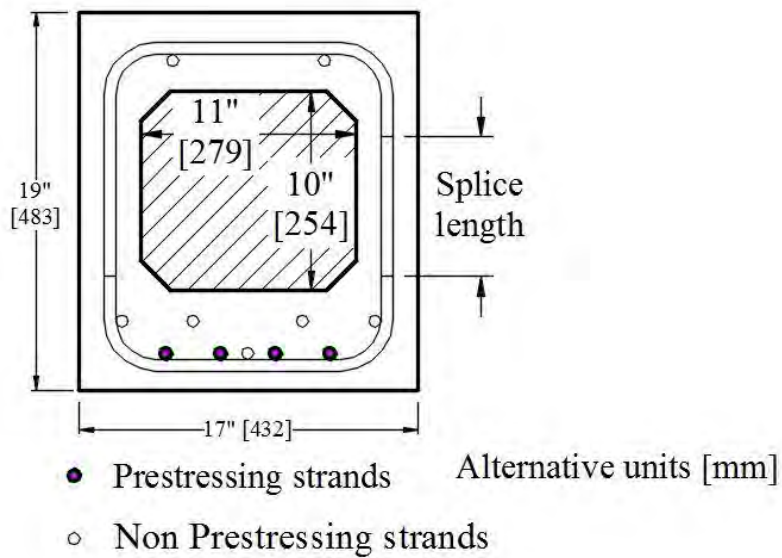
Cross-sections of prestressed box-beam reinforced with spliced stirrups in shear
